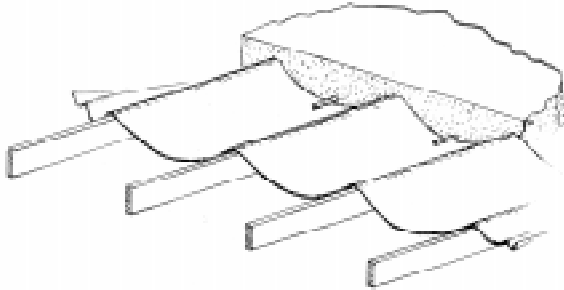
Schematic drawing of fabric formwork allowed to deflect between shoring beams.
